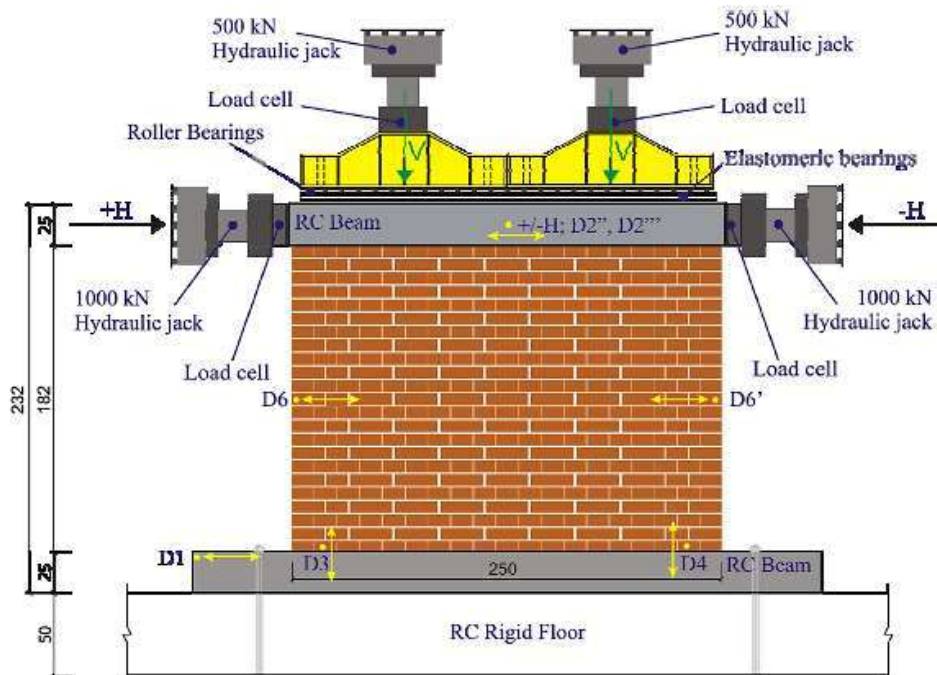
Full setup of masonry wall for cyclic test (Sergey and Elena, 2011)
